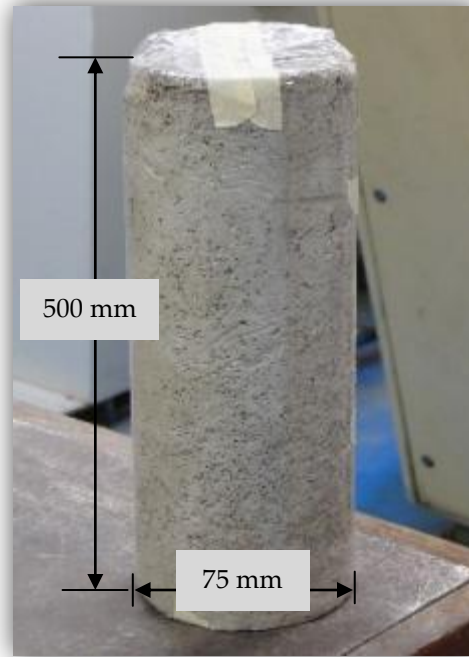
After 24 hours, foamed concrete demoulded and wrapped in 'cling film'
